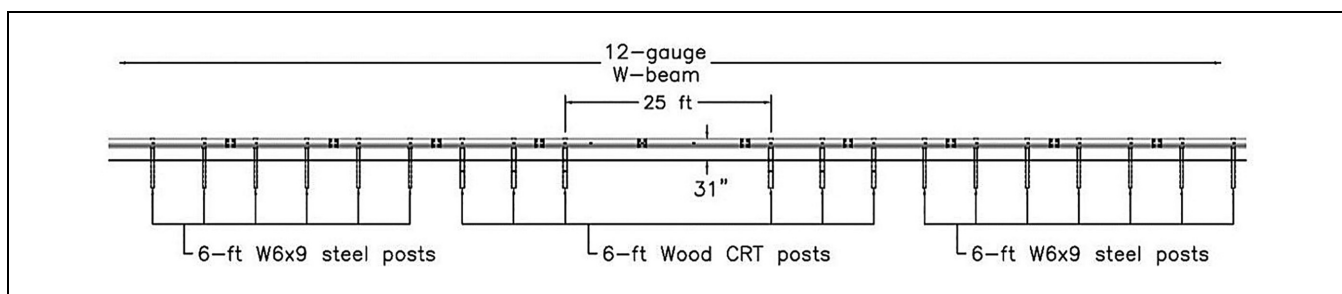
MASH-compliant, Midwest Guardrail System long-span guardrail system (2, 3).
